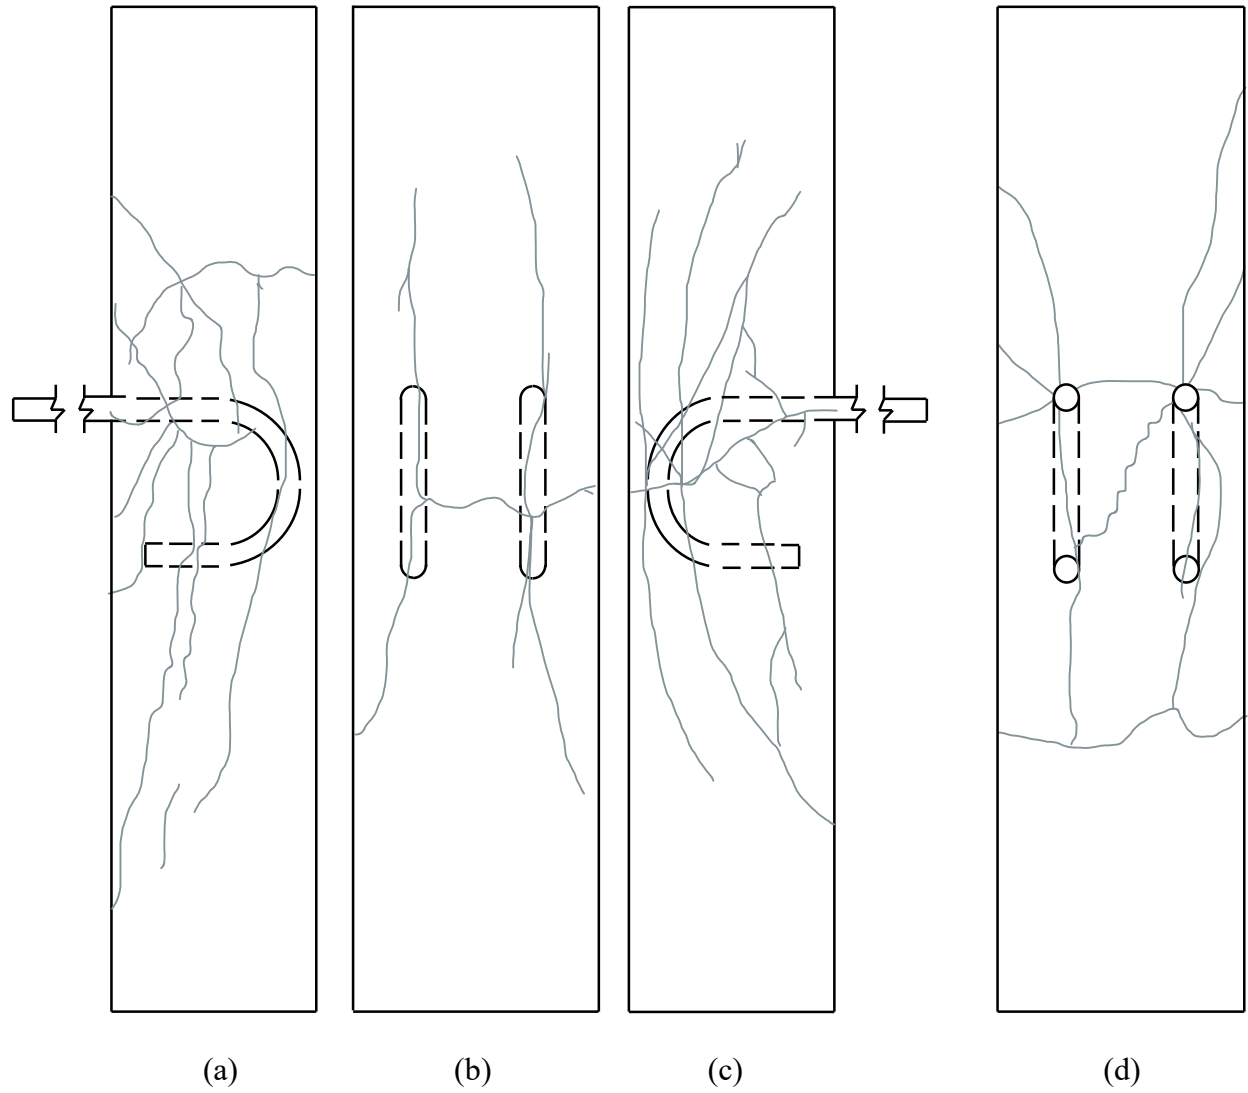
Crack pattern at maximum normalized tensile load for beam-column joint specimen P5-180: (a) west side face, (b) back face, (c) east side face, and (d) front face
